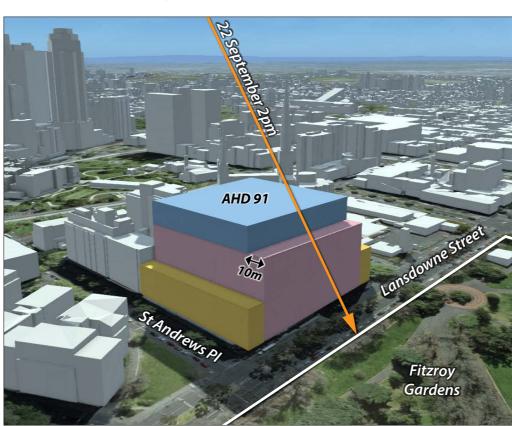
Taller building elements to be set back 10m with 10% of the street wall length allowed to encroach into this space
